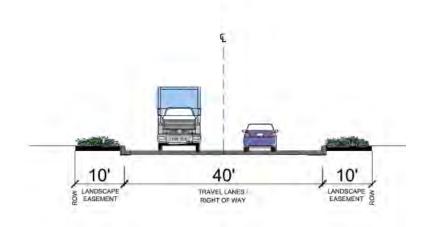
25TH AVENUE STREET SECTION (DEVELOPMENT AREA)
